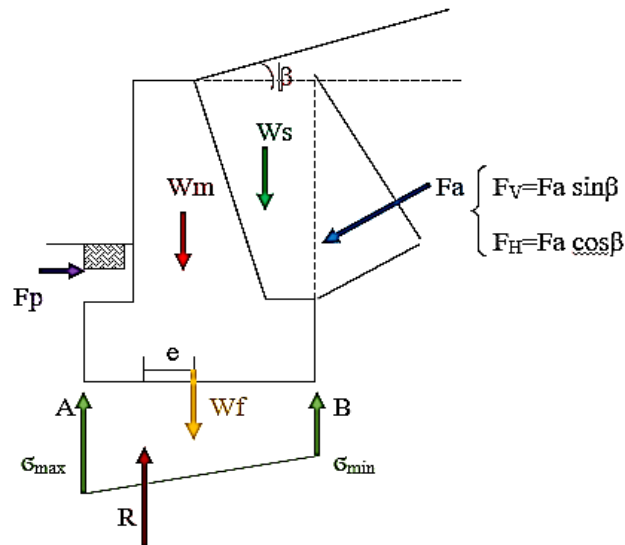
Acting forces on a gravity wall according to Rankine.
